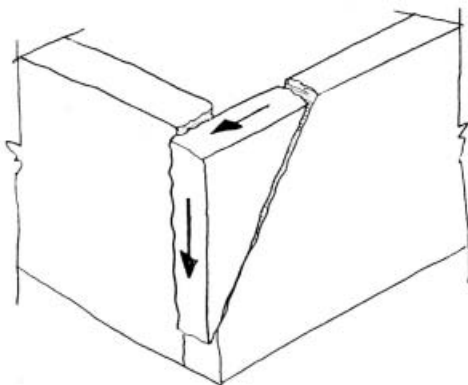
Diagram showing vertical and horizontal displacement of a wall section at a corner.
